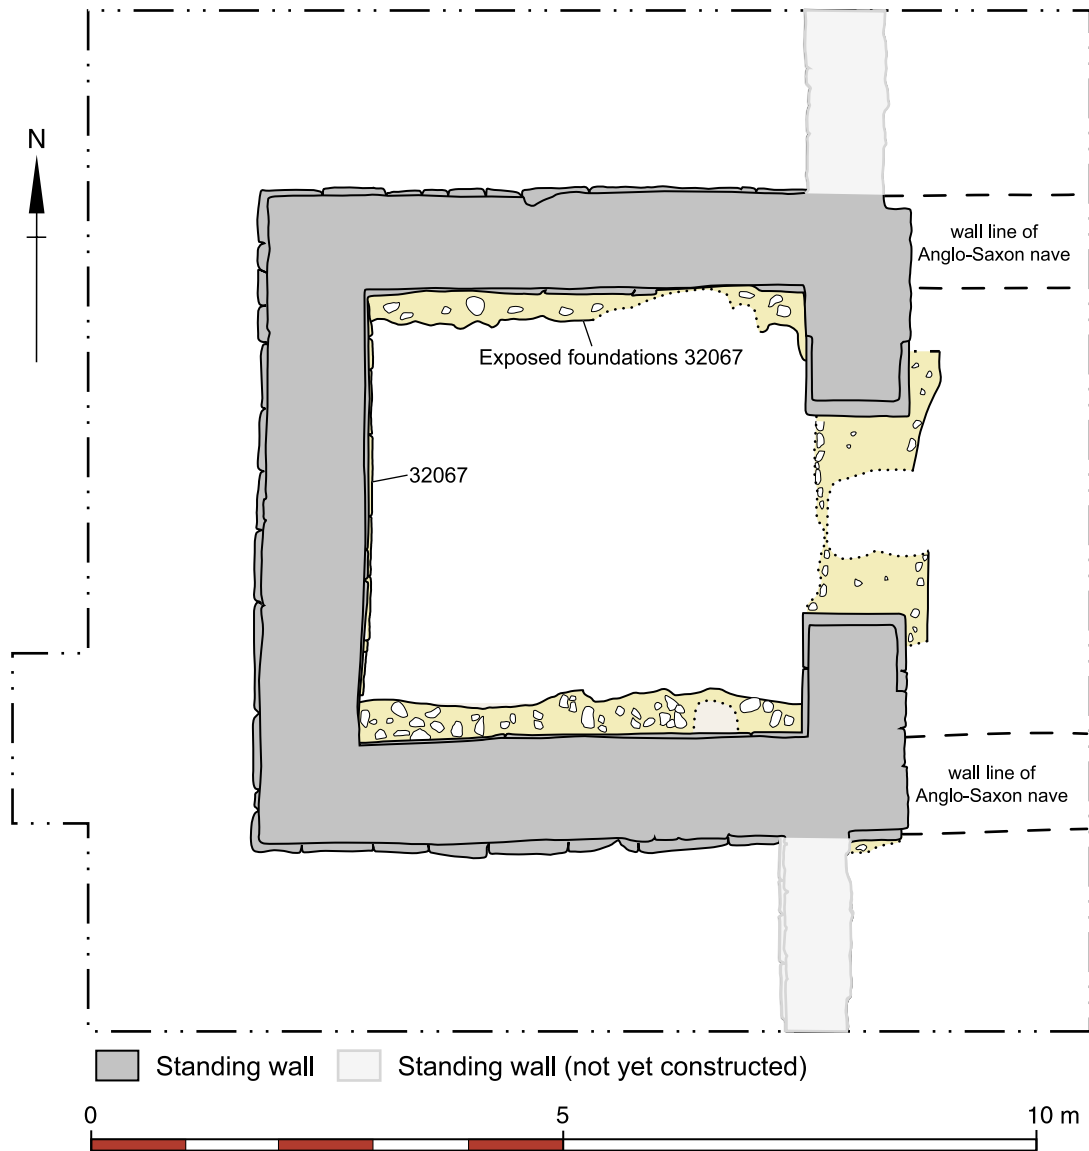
Construction of the standing tower (Trench 1). Scale 1:80
